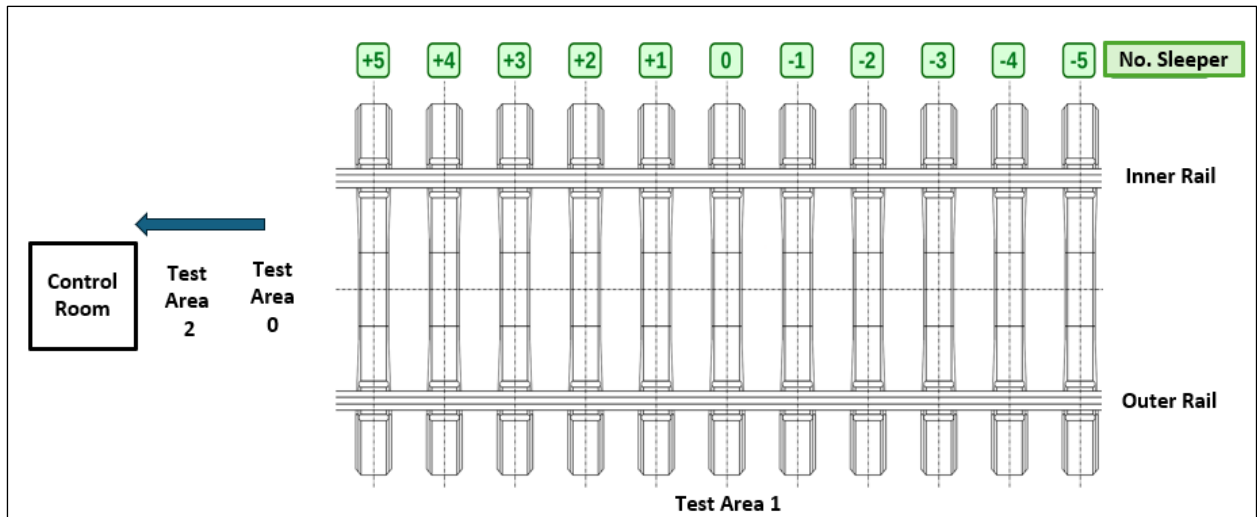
Plan view of the track section with sleeper numbering at test area 1
